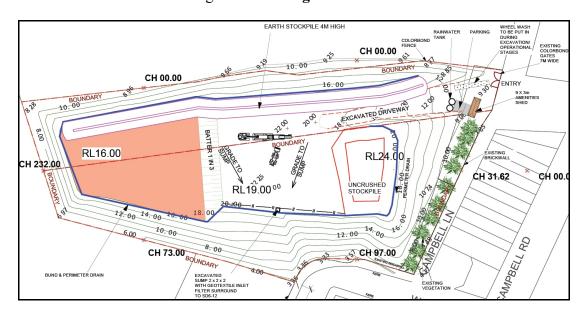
Extract from the Stage 2A plan of the proposed development. Full details are provided on Drawing No.13, Issue E of the plans of the proposed development at Appendix 9.
